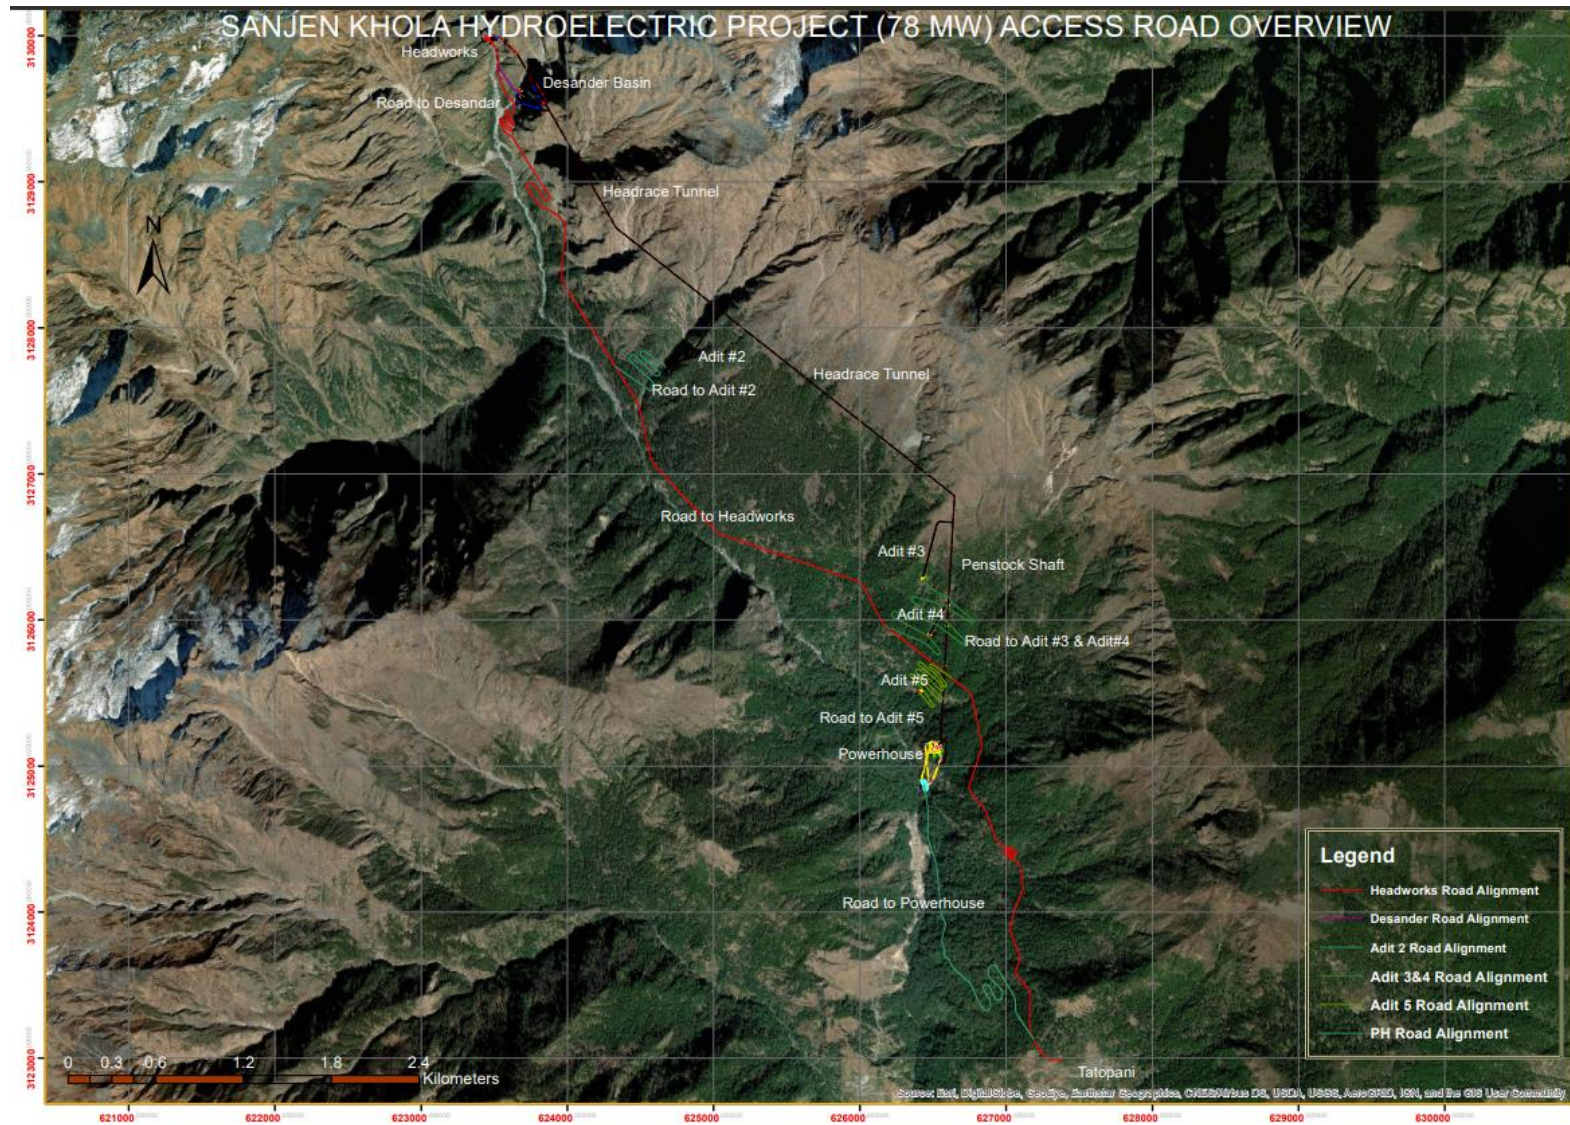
SKHEP Access Road Overview (Source: Detail Design Report 2021 and ARC GIS 10.1)
